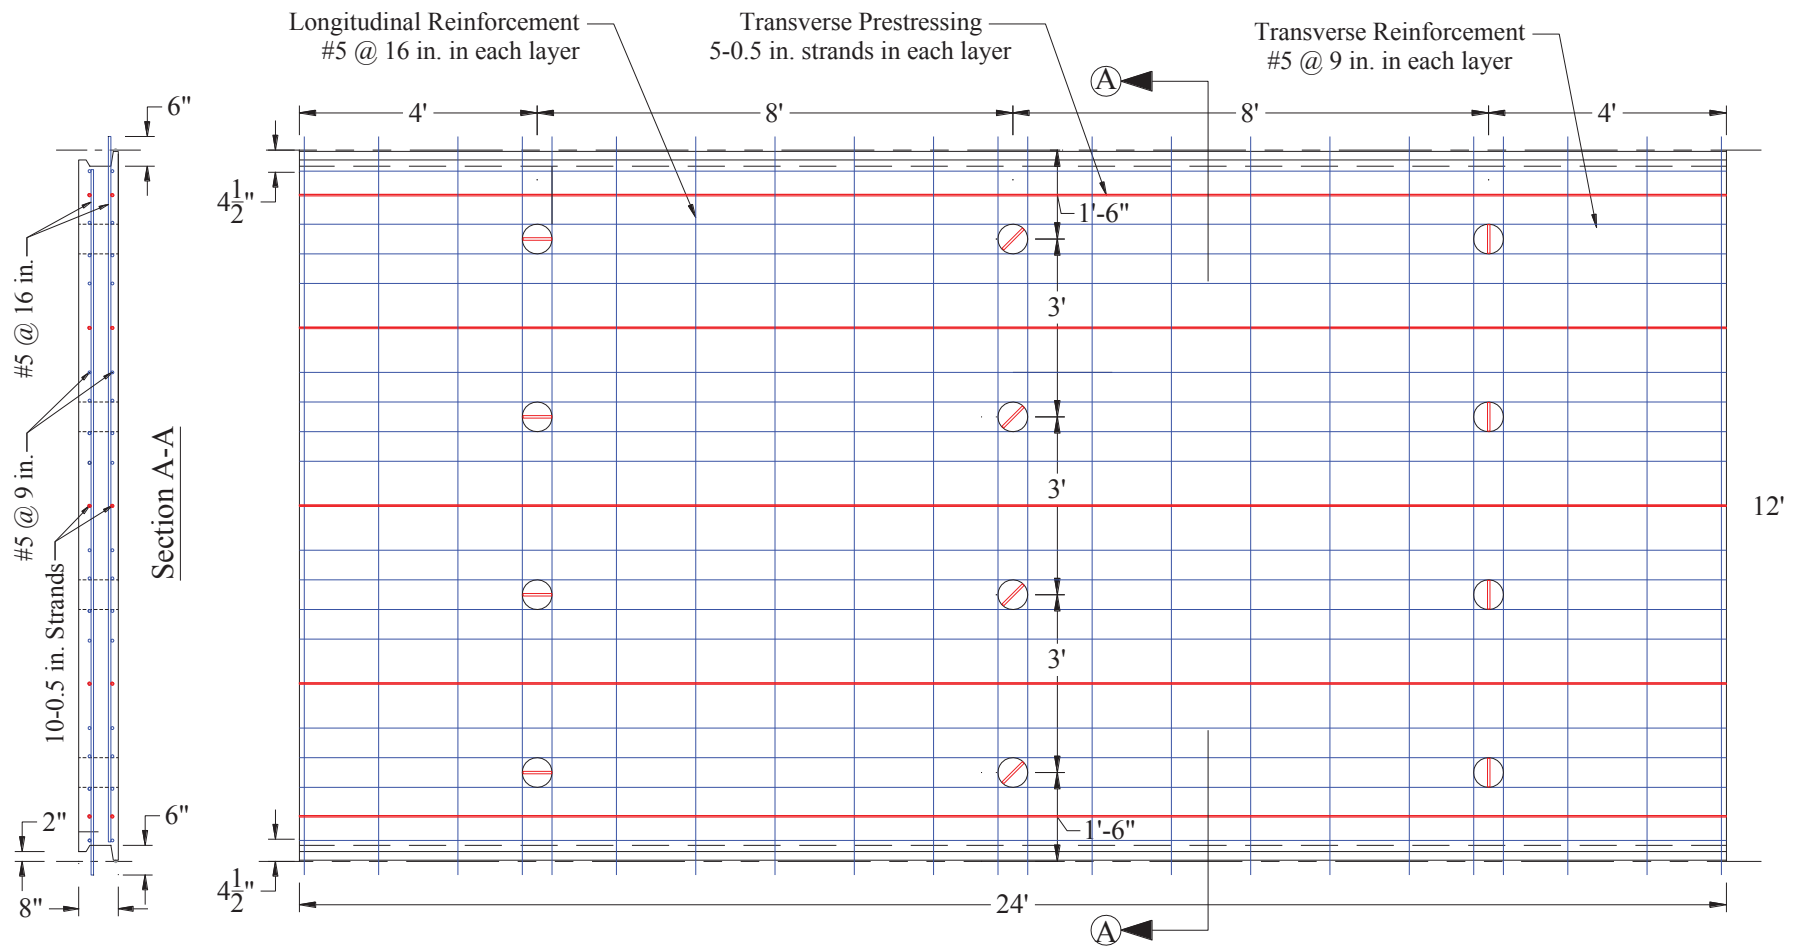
Panel Reinforcement and Pre-Tensioning for Proposed Connection.
